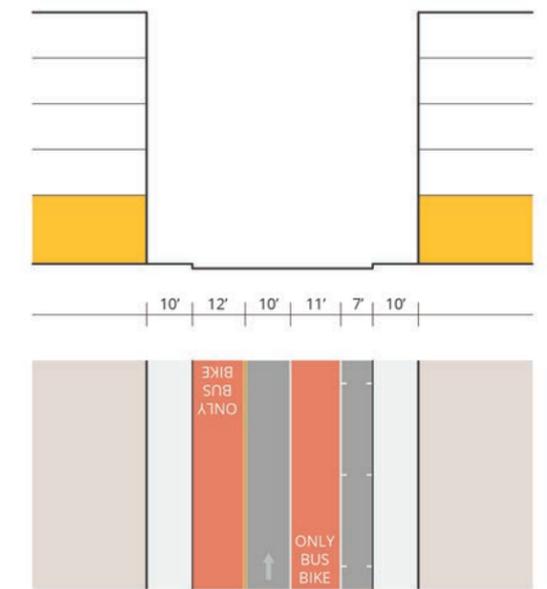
MERIDIAN STREET SOUTH OF SARATOGA STREET - PROPOSED CONDITION
